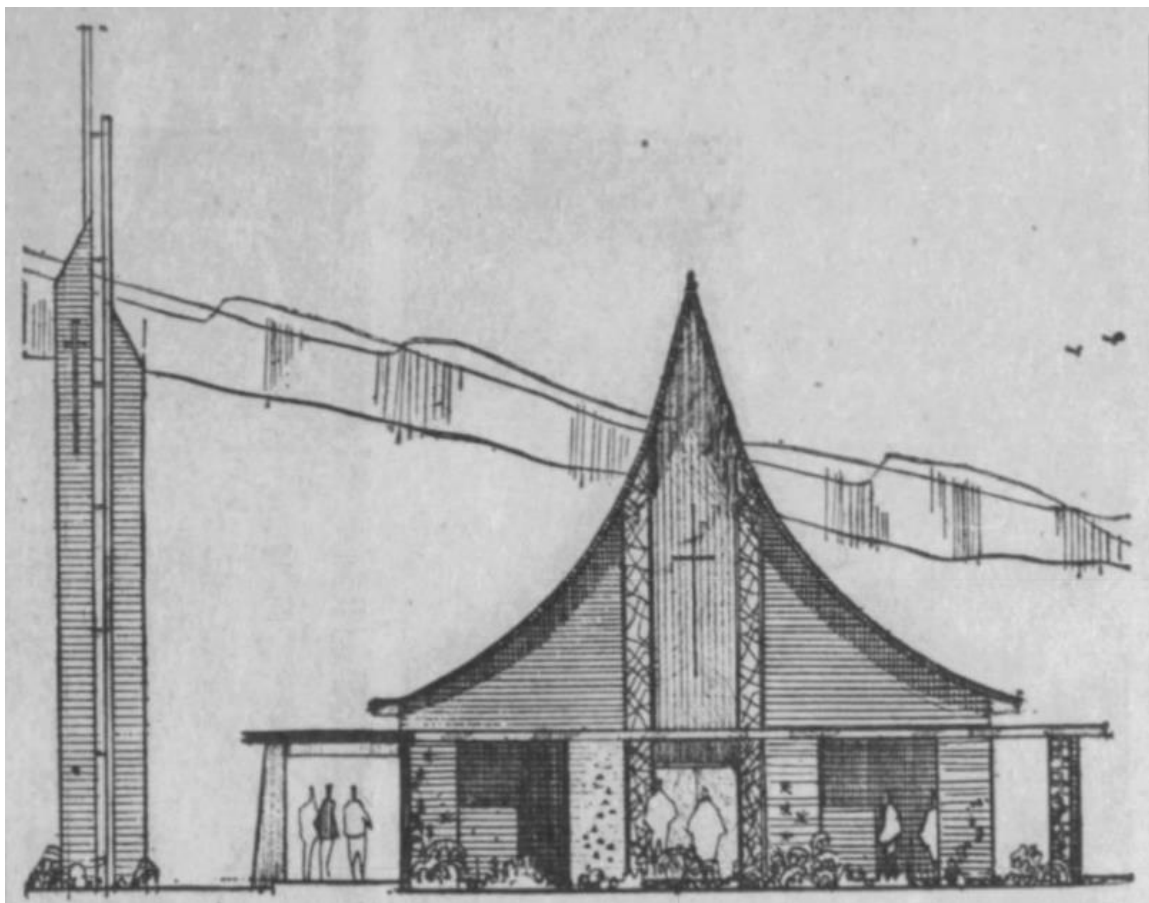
1963 plan for the new sanctuary and education building. The steeple pictured to the west does not appear to have been constructed.⁷⁴
